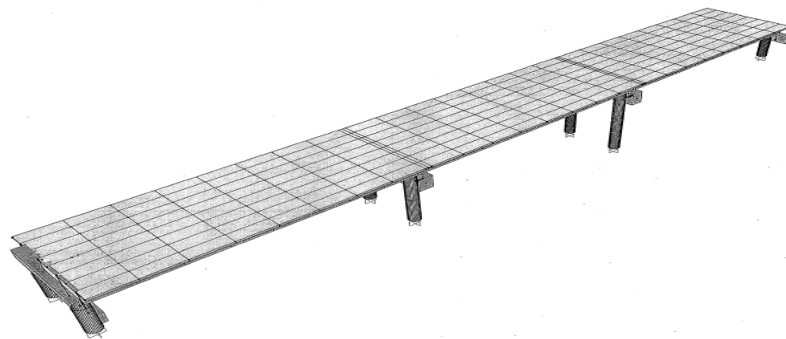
3-D SAP Model of Oseligee Creek Bridge
